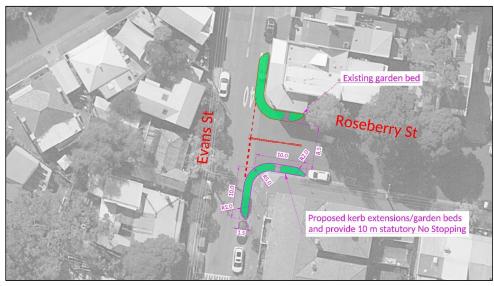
Evans Street / Roseberry Street T-intersection proposal.
